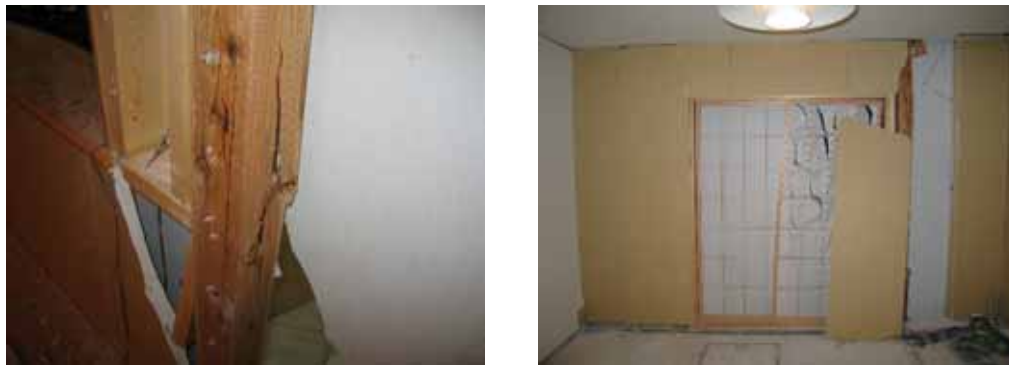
Damage of check sixth (Left: Column, Right: Inside)
